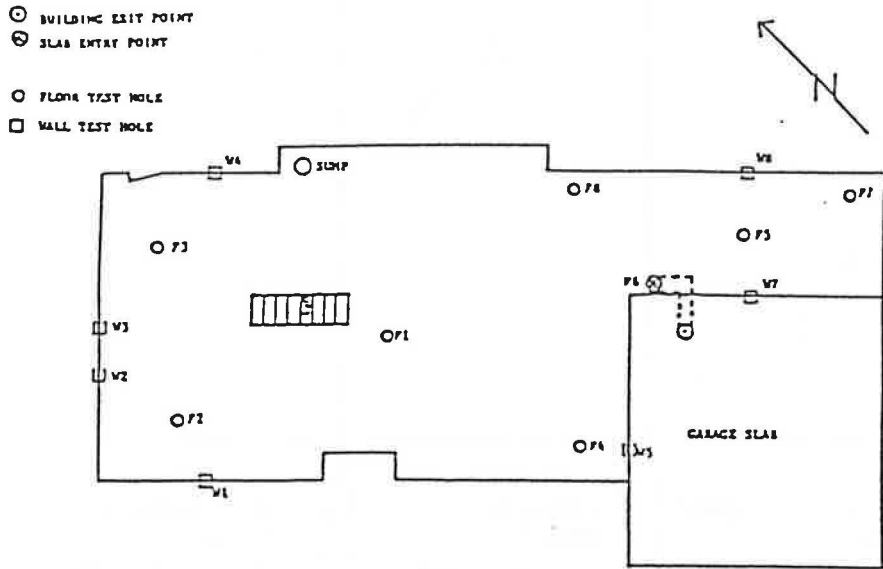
House No.2 basement floor plan showing the location of test holes, sump, and mitigation system slab penetration.
